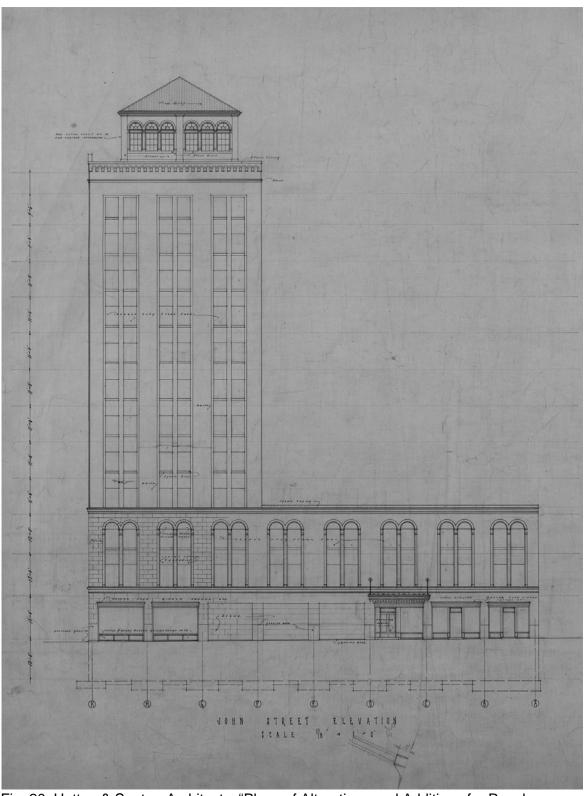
Hutton & Souter, Architects, "Plans of Alterations and Additions for Royal Connaught Hotel Hamilton," 27 Apr. 1931, Souter, Bell, Howard and Souter Fonds, Archives of Ontario, C12-1-0-458, Container # L-717, Barcode B732587, Drawing No. 10 – John Street Elevation.
